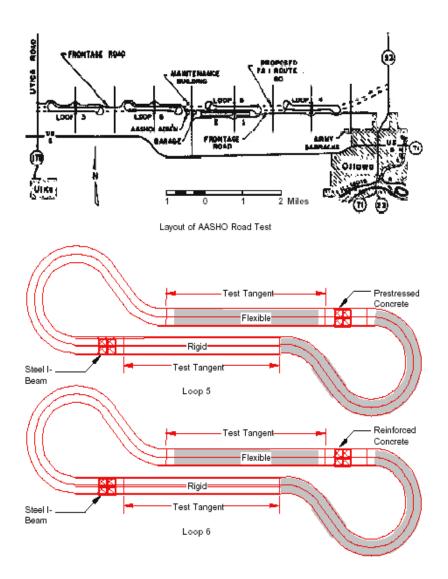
Layout and location of the AASHO Road Test and test loops examples (loops 5 and 6) (from Highway Research Board, 1962)
